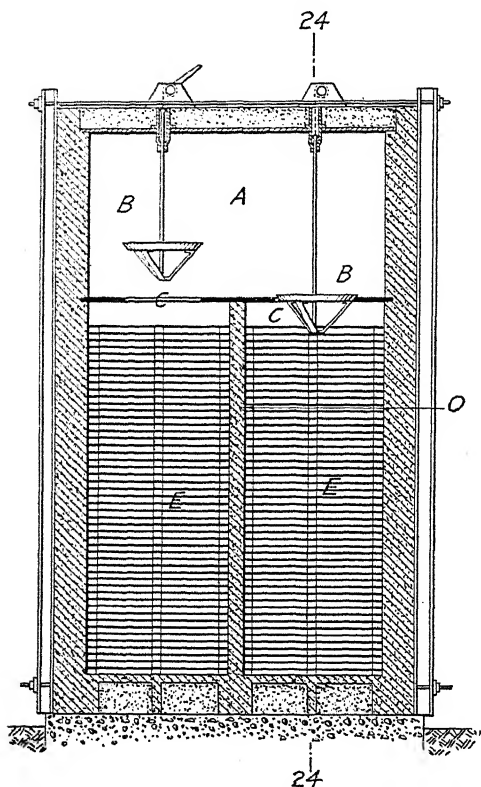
HOWARD DUST SEPARATOR. SECTION ON LINE 23-23 OF FIG. 24.
